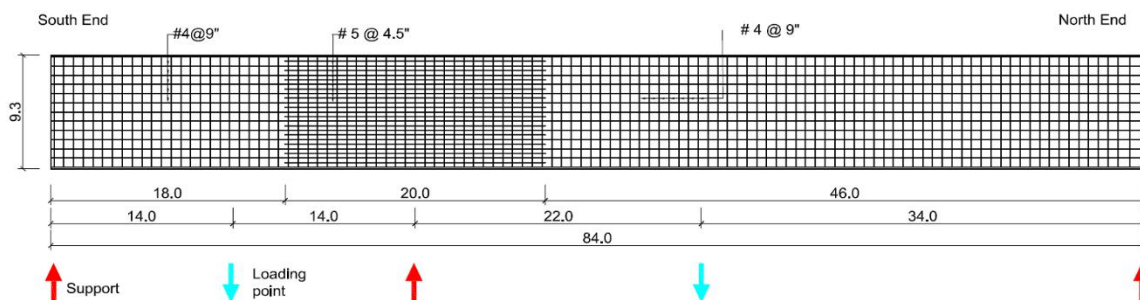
3 Deck Reinforcing Steel Layout in Tub 1
